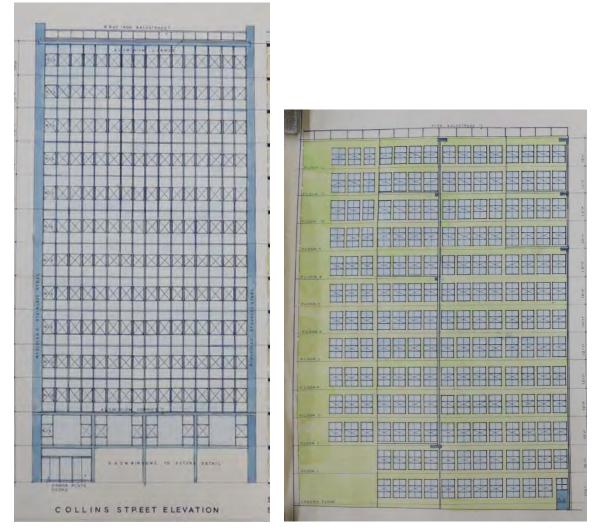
South elevation to Collins Street. Drawing by J A La Gerche, dated August 1957 (BAP).
